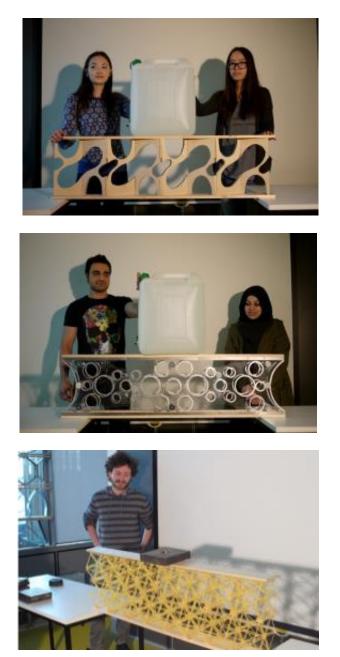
Open-web truss (2013) – Students were asked to design and build a truss that was 1400mm long and 330mm deep that could support a centrally positioned load of 20kg. (The size of the truss was based on the ground floor fenestration of the UoW Marylebone building.)
